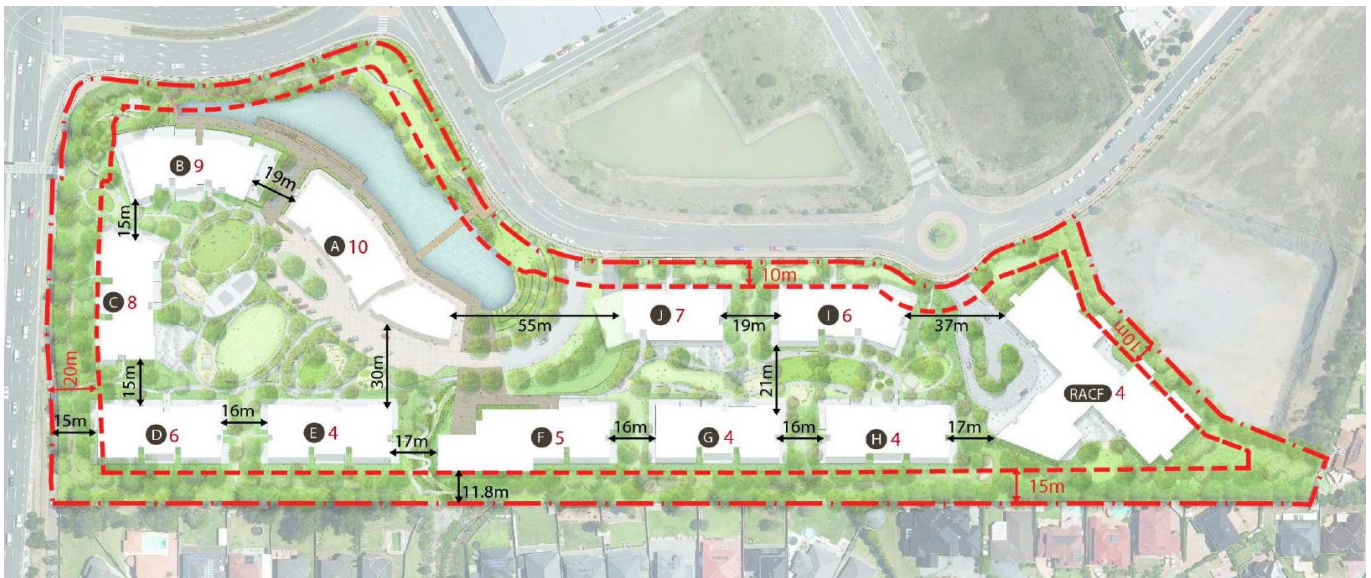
Proposed setbacks and building heights (Source: Architectural plans)
